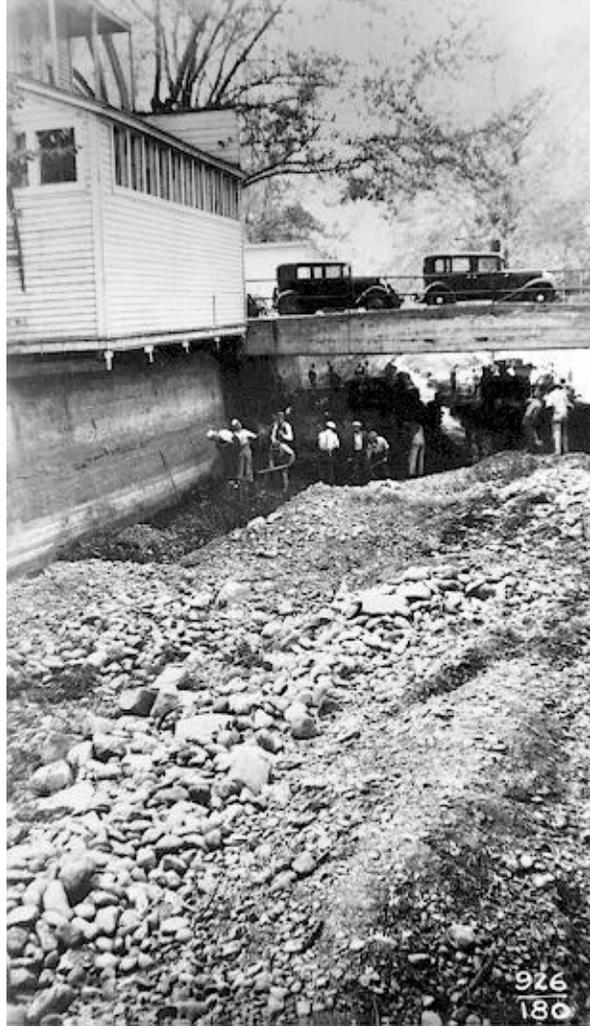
Hand excavation of channel under 4th Avenue Bridge (11/2/36).
